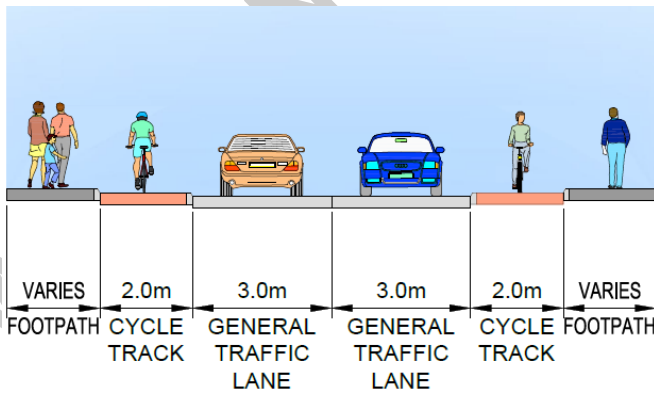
Section 1, Proposed Option 5 – Cross Section A-A
